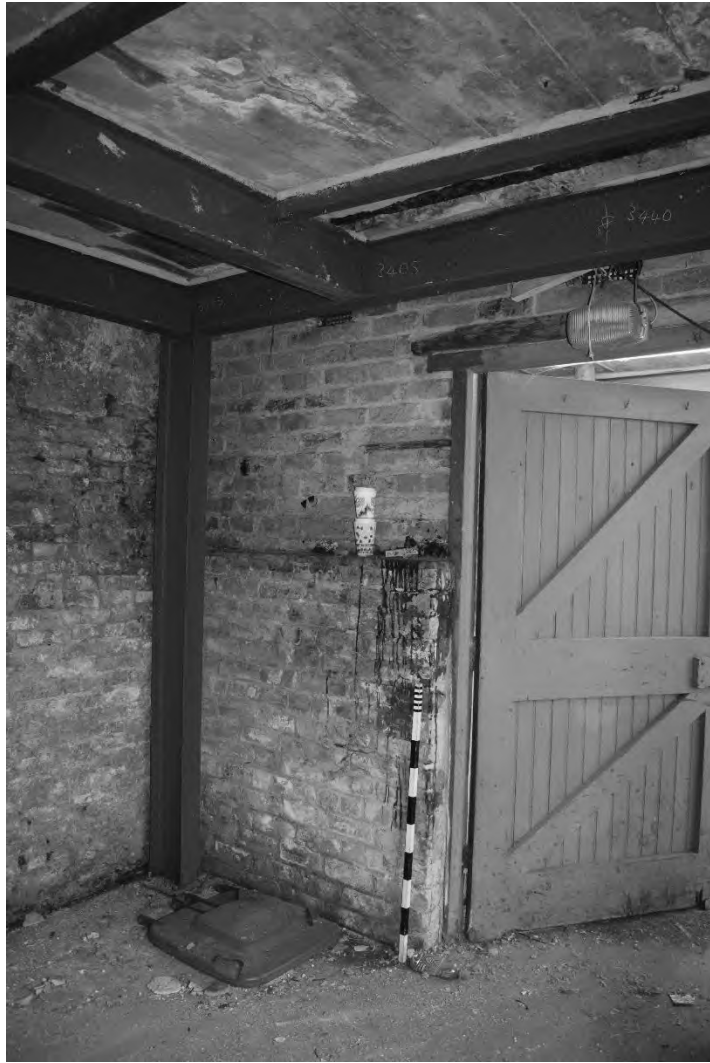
Interior First Floor Store (DSC_0652). Facing South-east.
